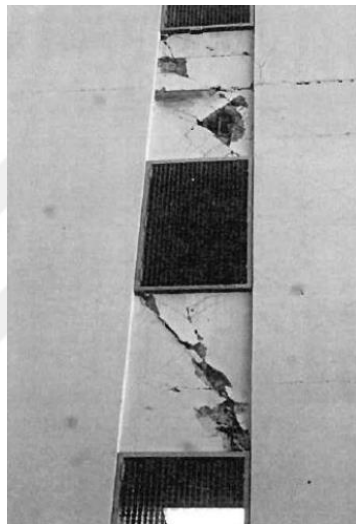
Failure of a short beam, the Northridge earthquake.
